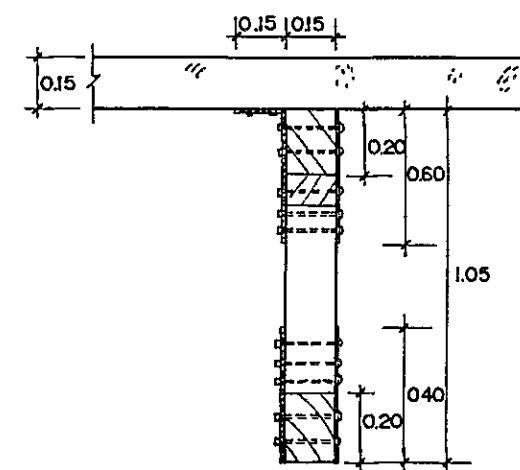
THE TEMPORARY METHOD ADOPTED TO STRENGTHEN THE CONCRETE FLOOR SLAB OF THE APPROACH BRIDGE - KRUNG THON BRIDGE
